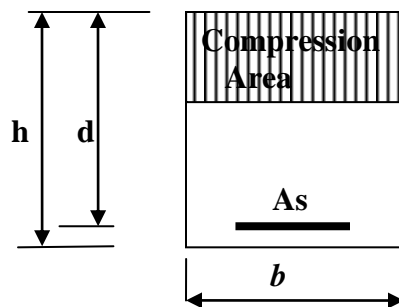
Cross Sections of Rectangular Reinforced Concrete Beam
